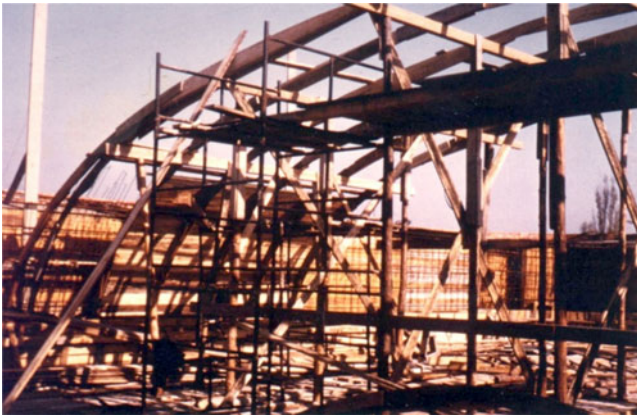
View of the assembled wooden centerings and their shoring. Behind them, visible reinforcement of the abutment beam B1 and its formwork.
